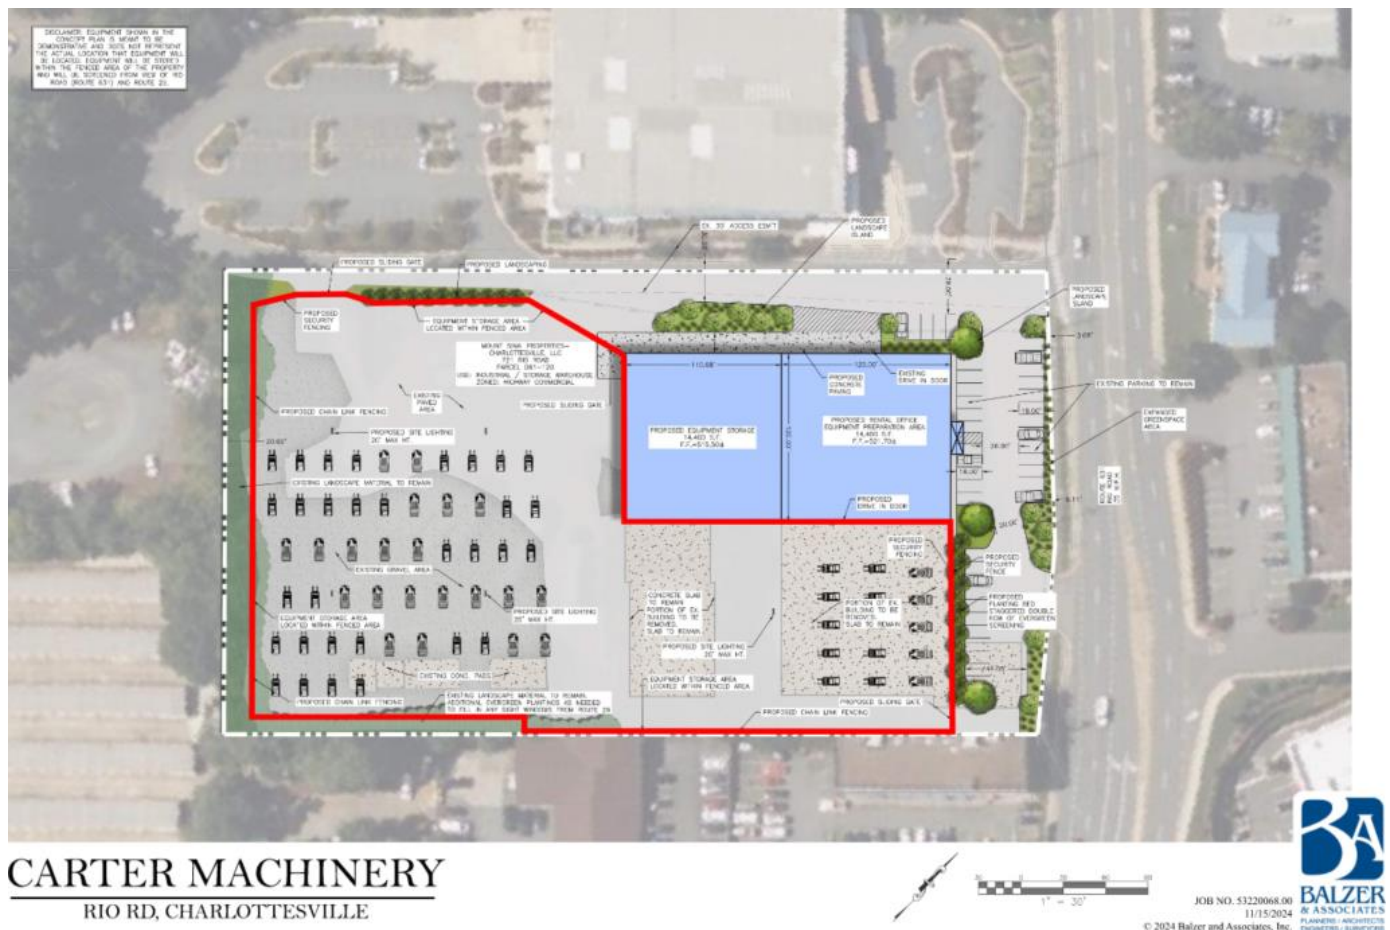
Proposed concept plan with the outdoor storage area outlined in red.
